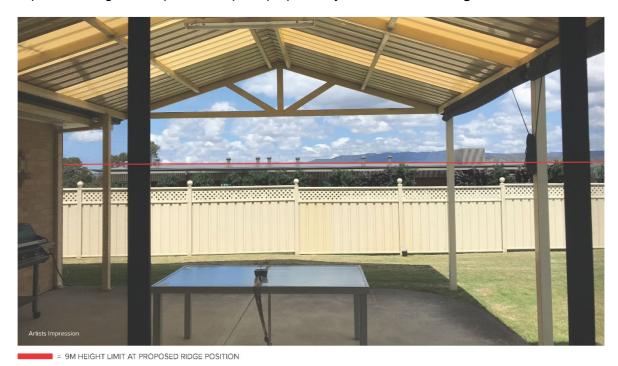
Proposed view from No. 32 Denham Drive (new roof profile) with red line to indicate a compliant ridge height
